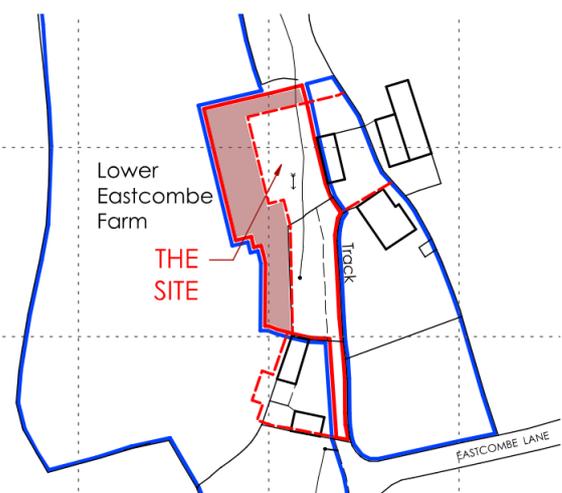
Proposed site area outlined in red, and additional area over approved scheme hatched in pink.
